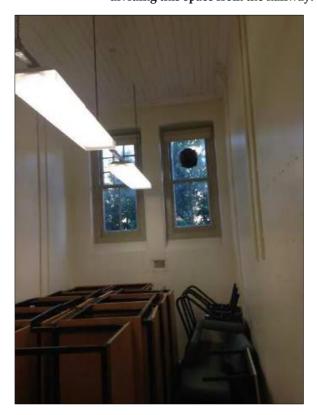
Room 167 in the *CMP* 2016. It is proposed to remove the dividing wall between this room and Room 168. This room has rendered walls, a timber floor (covered by carpet) and a timber lined ceiling. Room 170, another storage room on this level, is similarly finished. *CMP* 2016.
